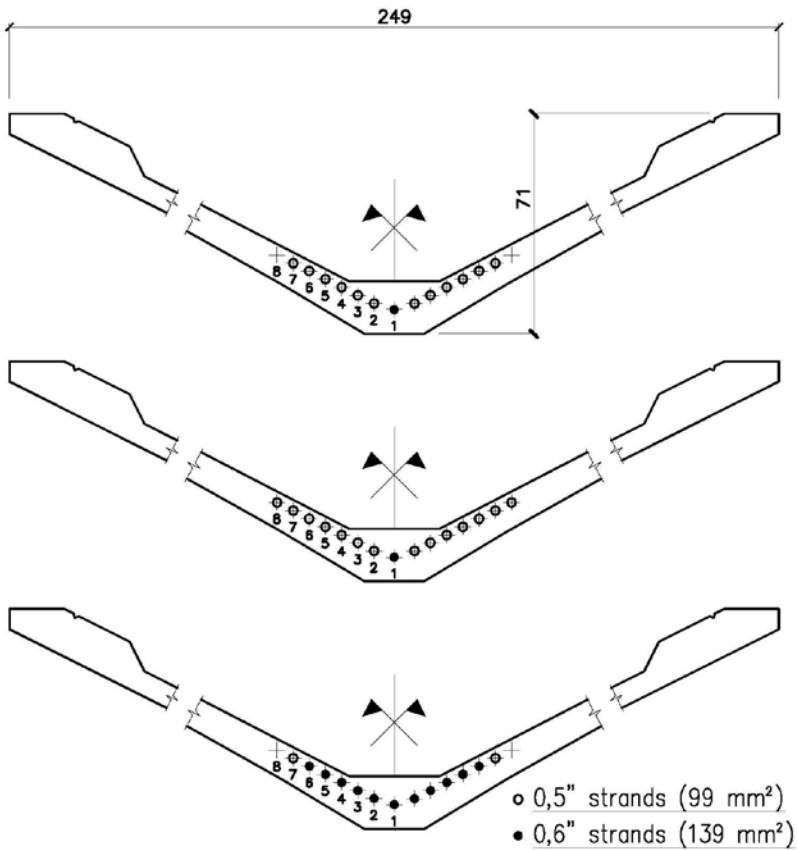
Cross-sections and pre-stressing strands of the wing-shaped members tested in this project; from top to bottom: Tests 1, 2 and 3 (measurement unit: cm).
